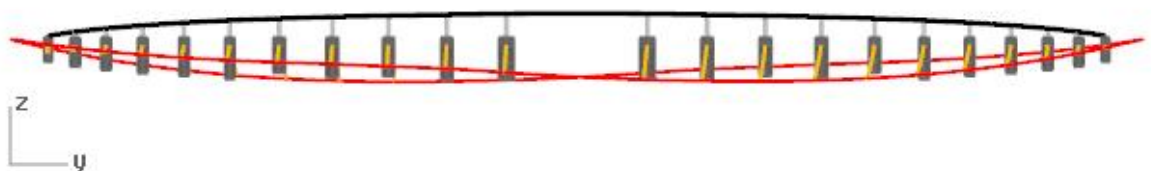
SIDE VIEW ANCHORING SYSTEM
